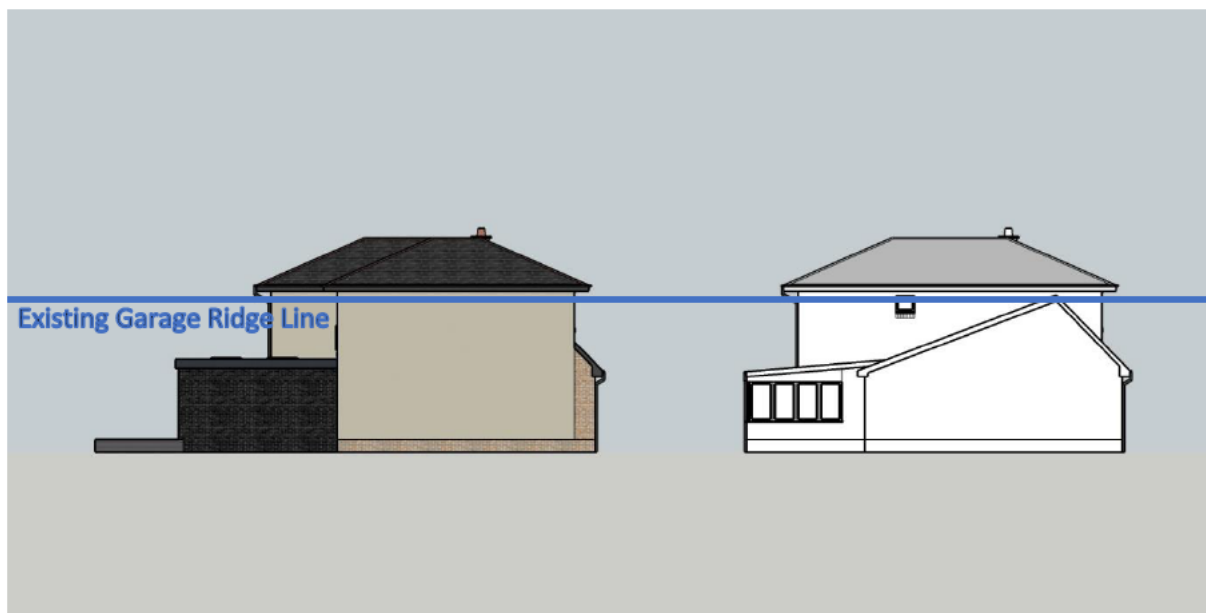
Existing (Right) and Proposed (Left) Side Elevations
